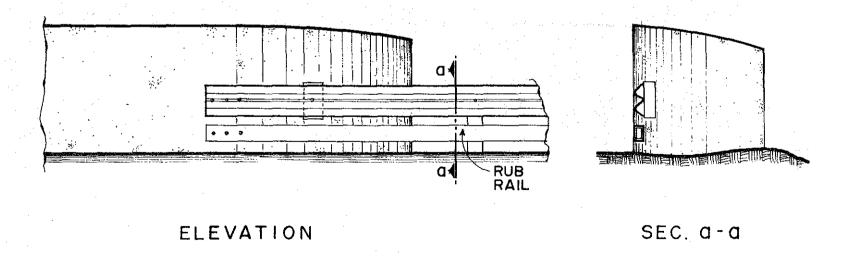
A Suggested M-Beam to Parapet Connection
